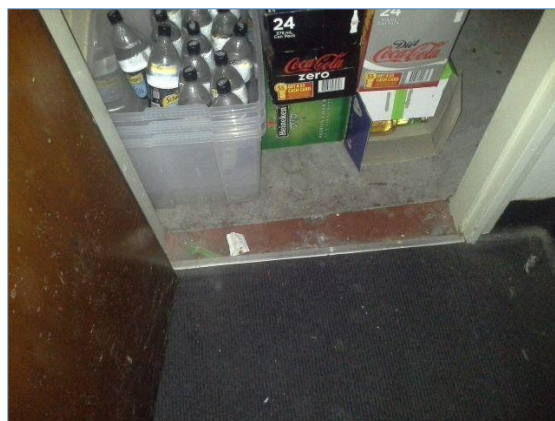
Level 1 - White paint to timber ceilings and window and door frames
